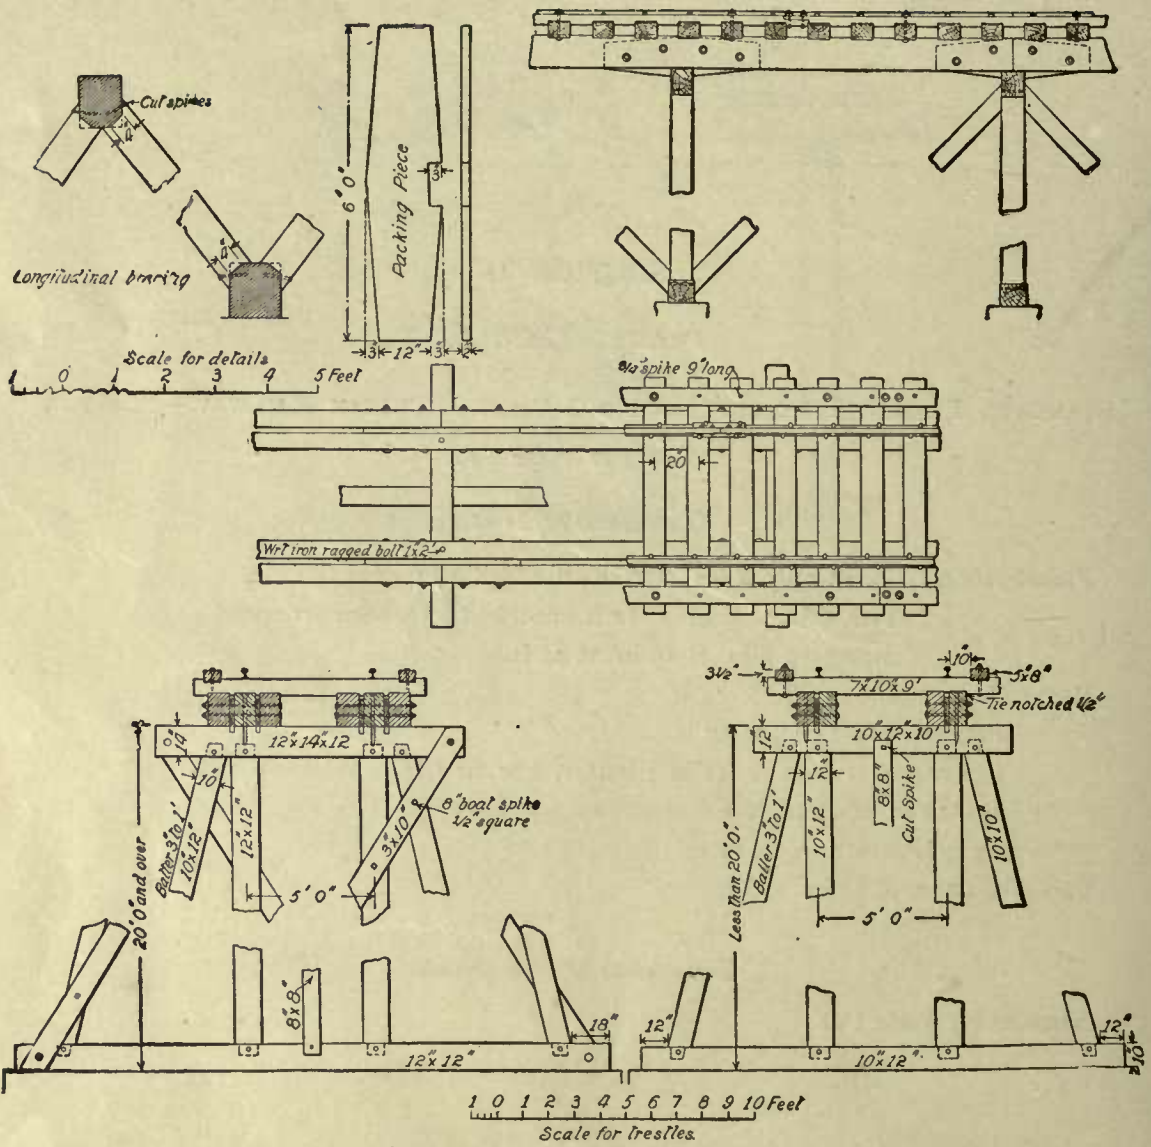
PLATE XI.—STANDARD FRAMED TRESTLES, PENNSYLVANIA RAILROAD.
